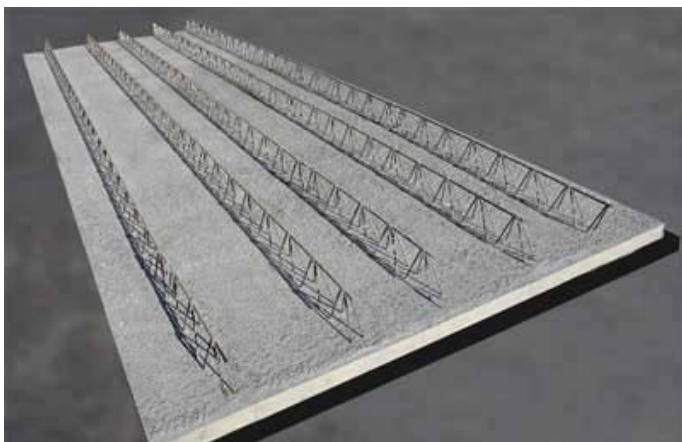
Precast Concrete Lattice Girder Plank(© Oran Pre-cast Ltd.)
